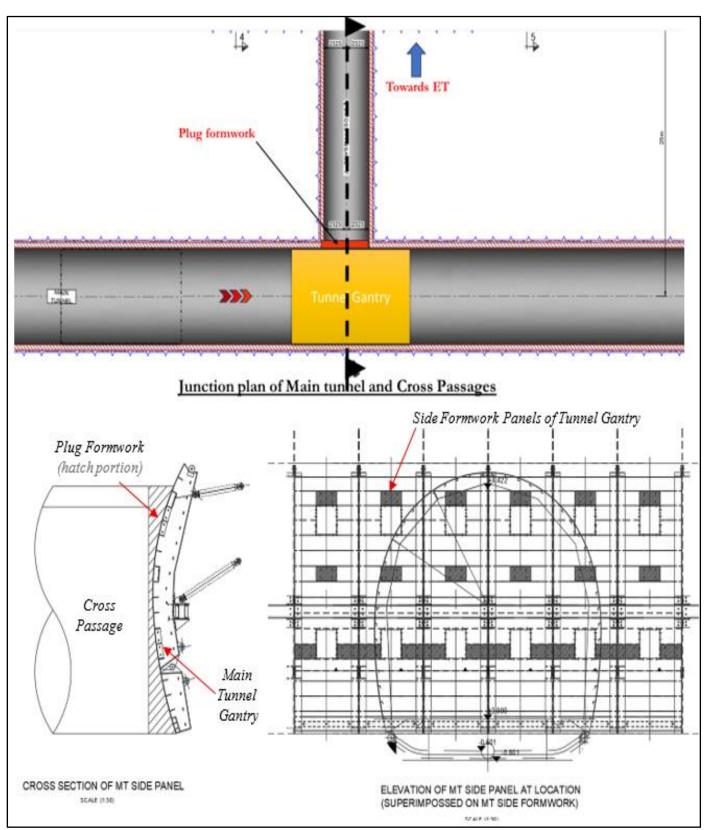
Highlighting Details of Plug Formwork at Cross Passage
